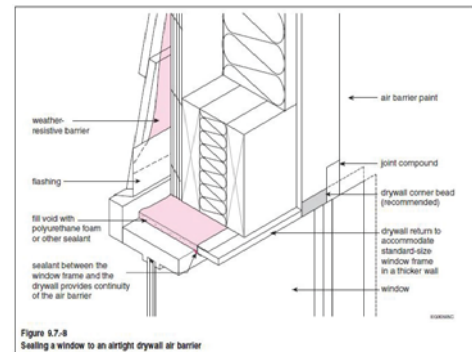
Sealing a window to an airtight drywall air barrier
